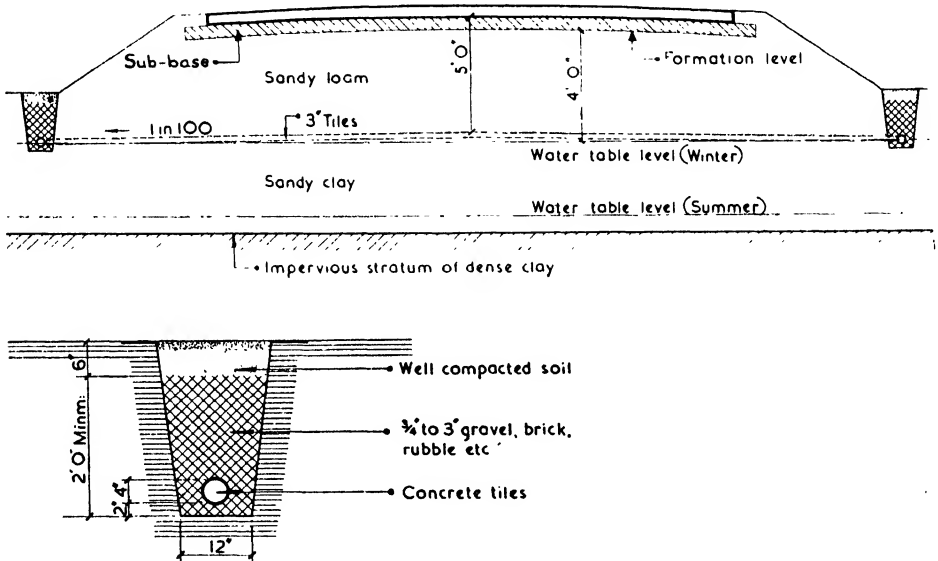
TYPICAL DRAINAGE DETAIL.
